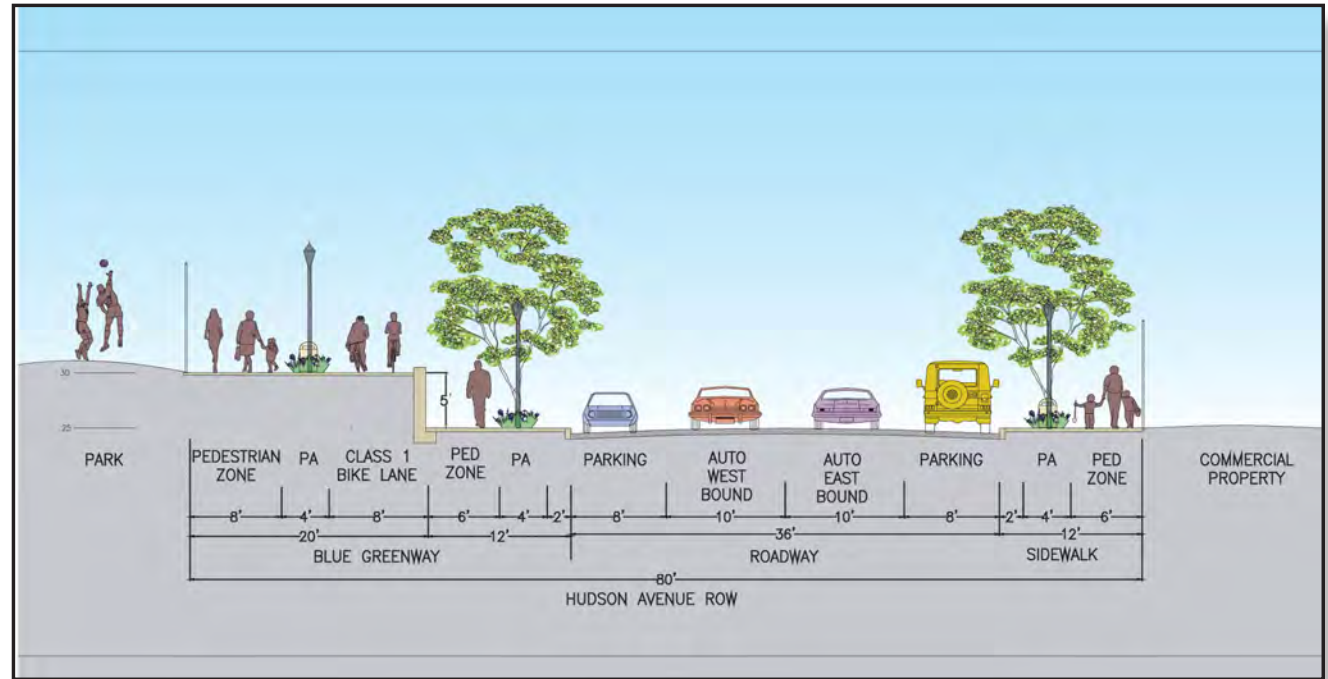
Hudson Avenue Roadway Improvement Concept
